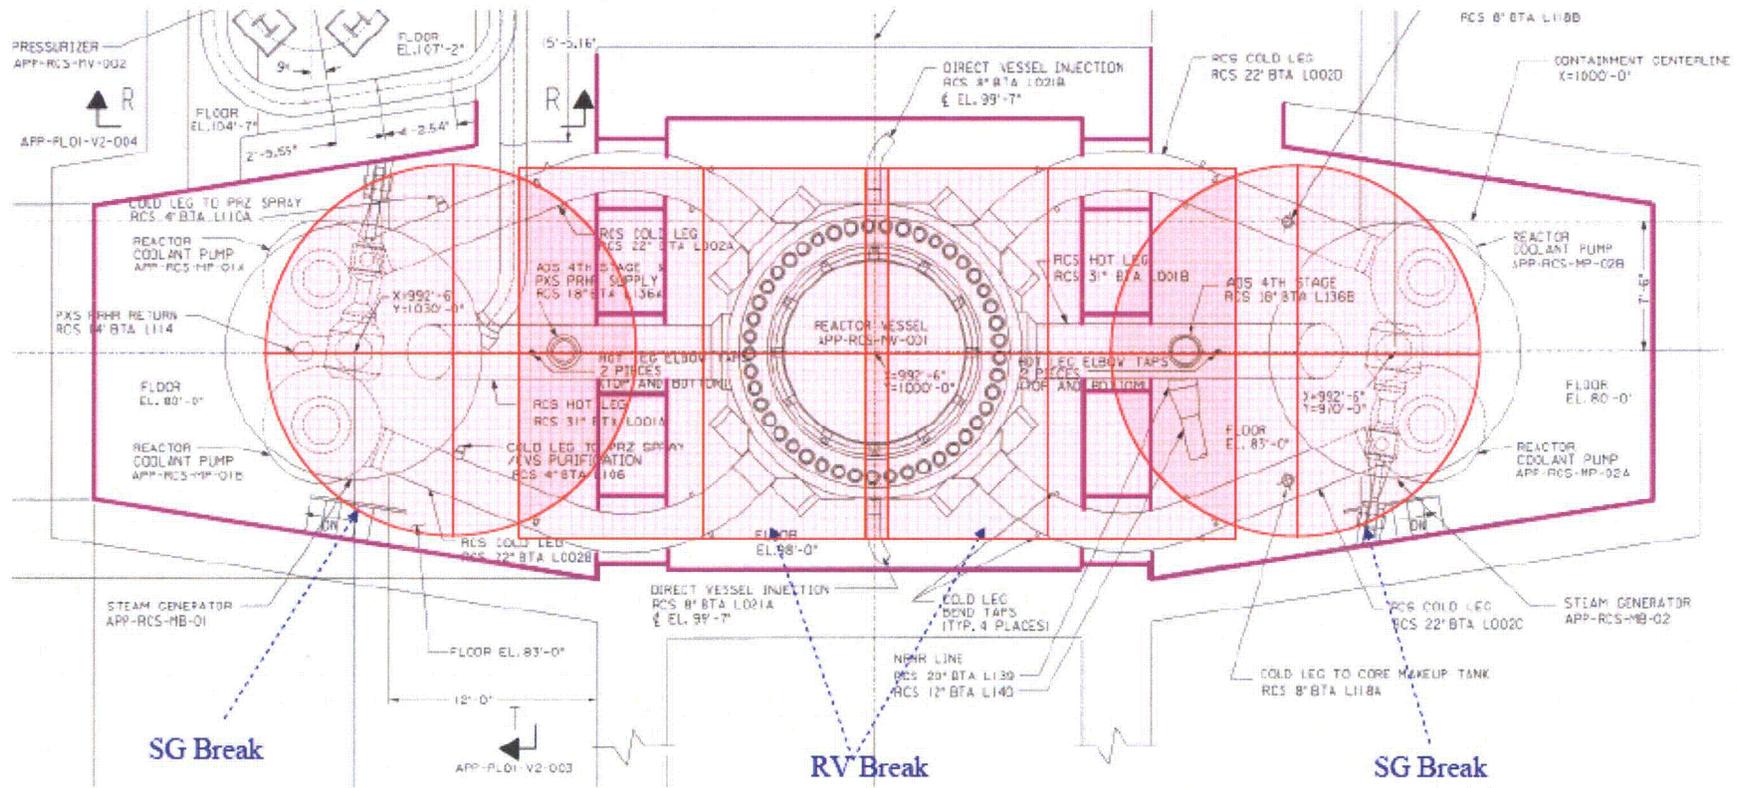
HL Break Breaks Plan View, Terminal End Break ZOIs
